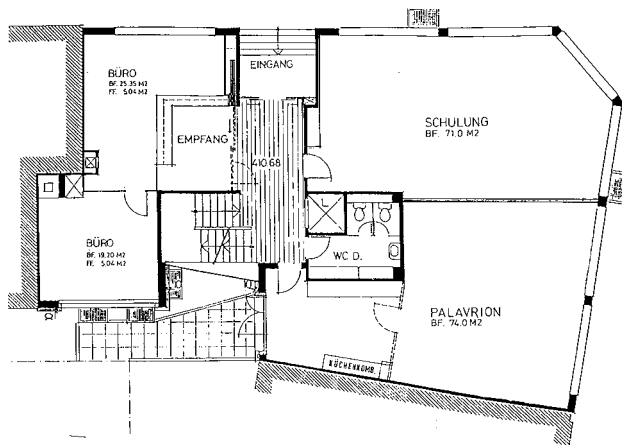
Plan view of the ground floor. The intermediate wall "supporting" the 1st floor slab is probably from masonry.
